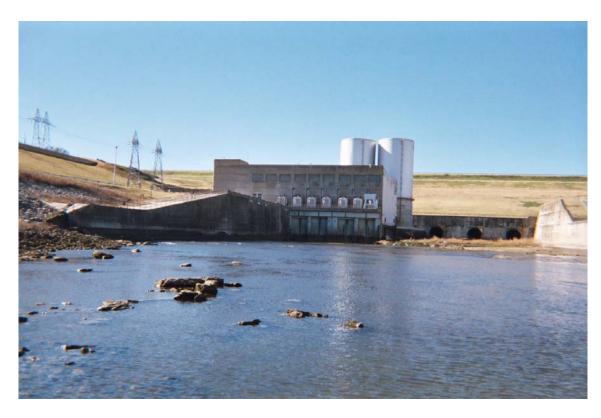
Hydropower Facility and Outlet Works at Denison Dam
